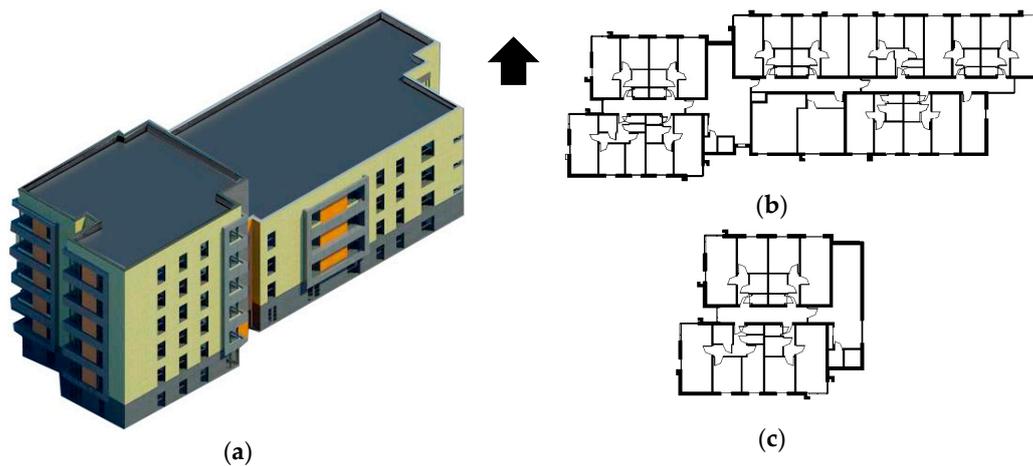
3D model (a); (b) ground floor to 3rd floor; and (c) 4th and 5th floor, the arrow shows the north side.
